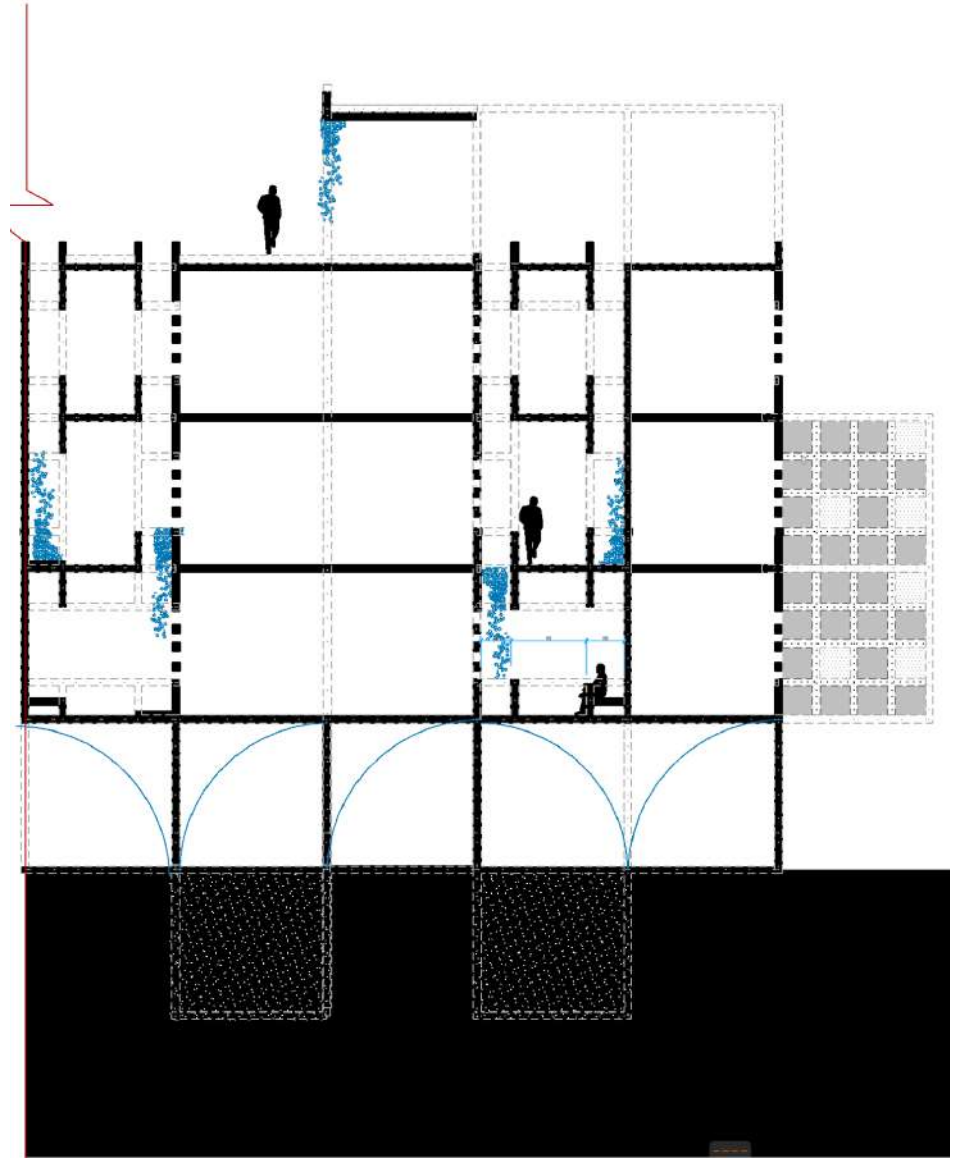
Functional scheme- building section to explain conceptual proposal of vegetation inside of building.
